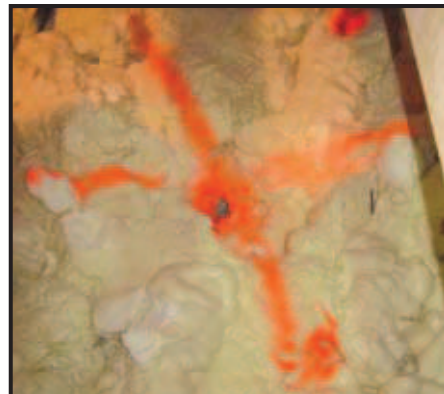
one of a few dozen blisters in the foam on the attic floor.
